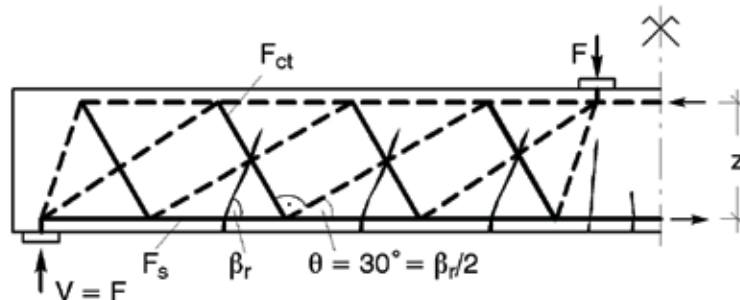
Truss model with inclined concrete ties for members without stirrups demonstrating the role of the concrete tensile strength (Reineck (1991 b))
